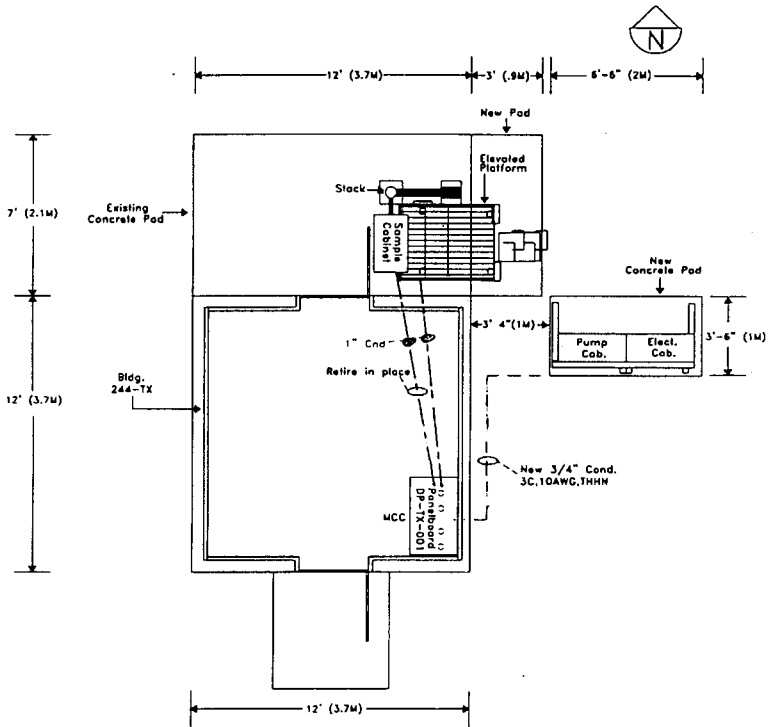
244-TX DCRT GEMS Upgrade - Plan View of Equipment Layout
